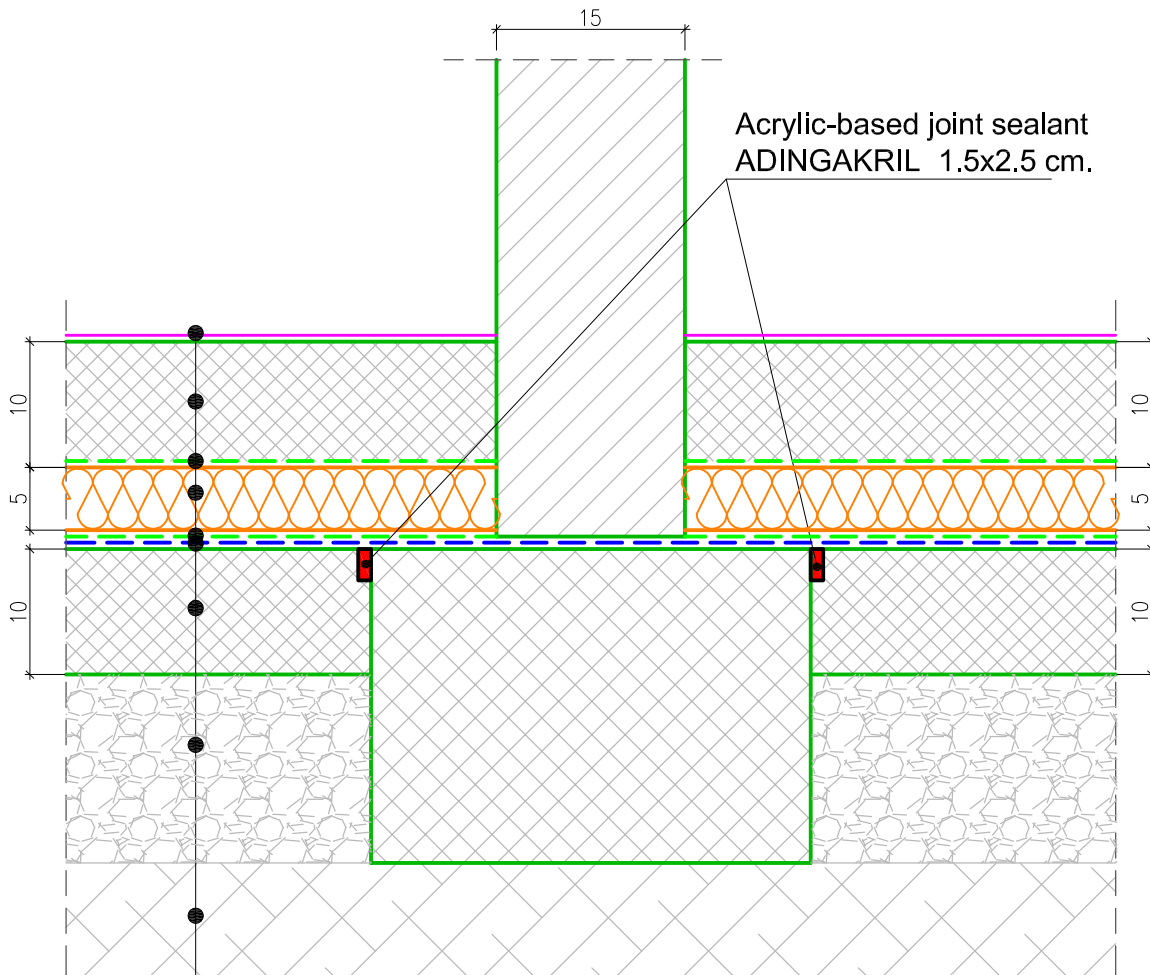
# DETAIL FOR CONSTRUCTION OF HYDROISOLATION OF CENTRAL FOUNDATIONS - FOUNDATION BEAMS AND PEARS
